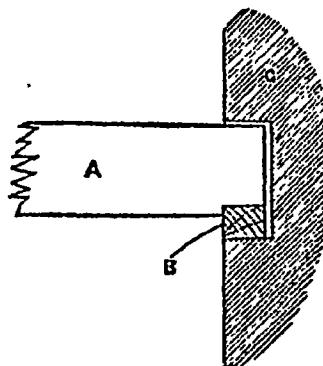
shows how the end of a beam should be built into a wall, a space for the free circulation of air being left. A is the beam; B is the wall-plate on to which the beam is notched; C is part of the wall. Scale = $\frac{1}{20}$.
